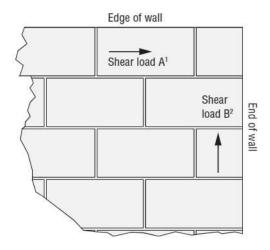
Direction of Shear Load in Relation to Edge and End of Wall
